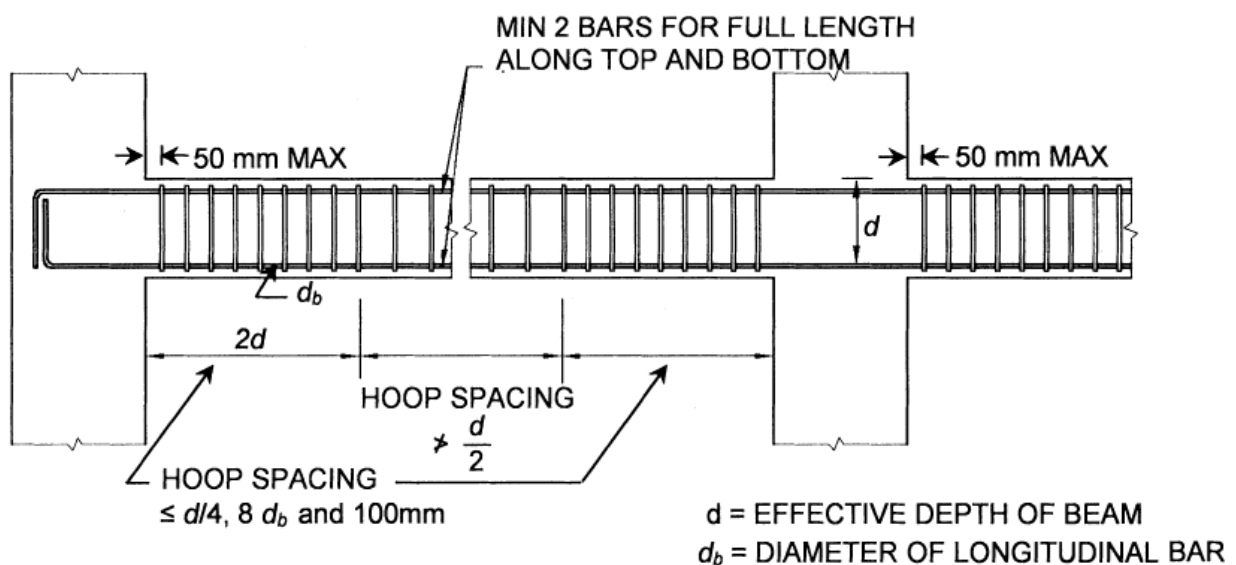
DETAILS OF TRANSVERSE REINFORCEMENT IN BEAMS
